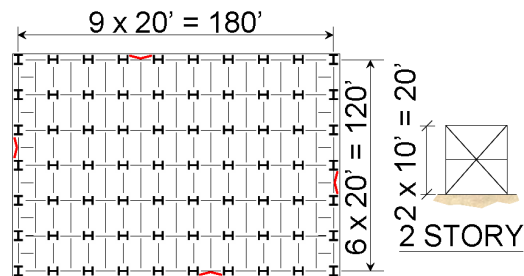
Plan and elevation of 2-story braced frame archetypes.
